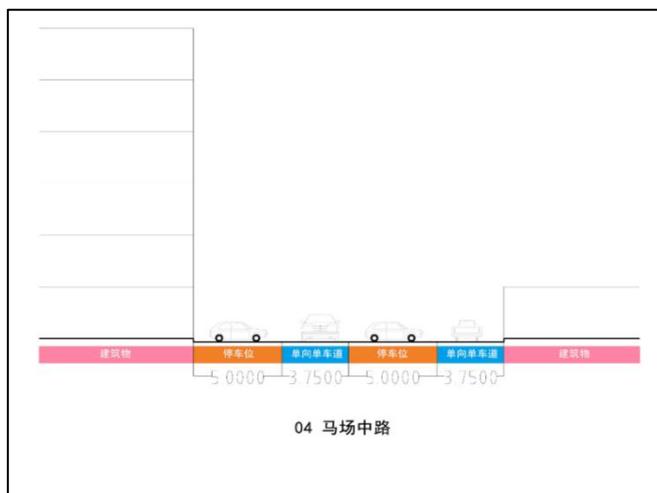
Machang Mid Road road section Resource: Self-drawn by the author
